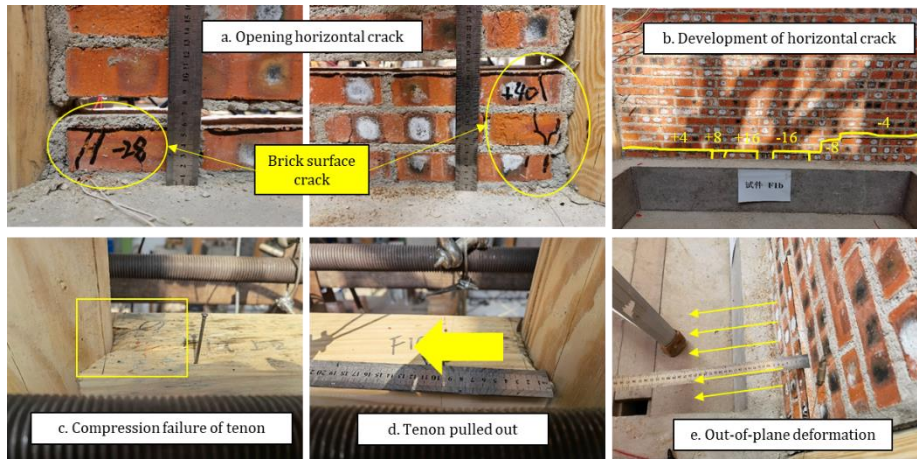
Experimental phenomena of the wall without damage (specimen F1b)
